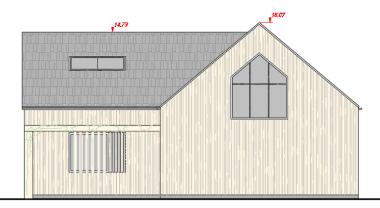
Façade designed to have minimal openings, with hit and miss timber cladding over some windows to minimise appearance of glazing.
